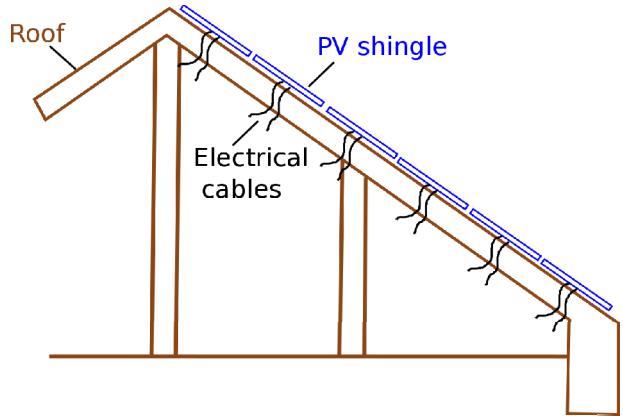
Schematic overview of BIPV roof shingles: electric cables breach the thermal envelope of the building
